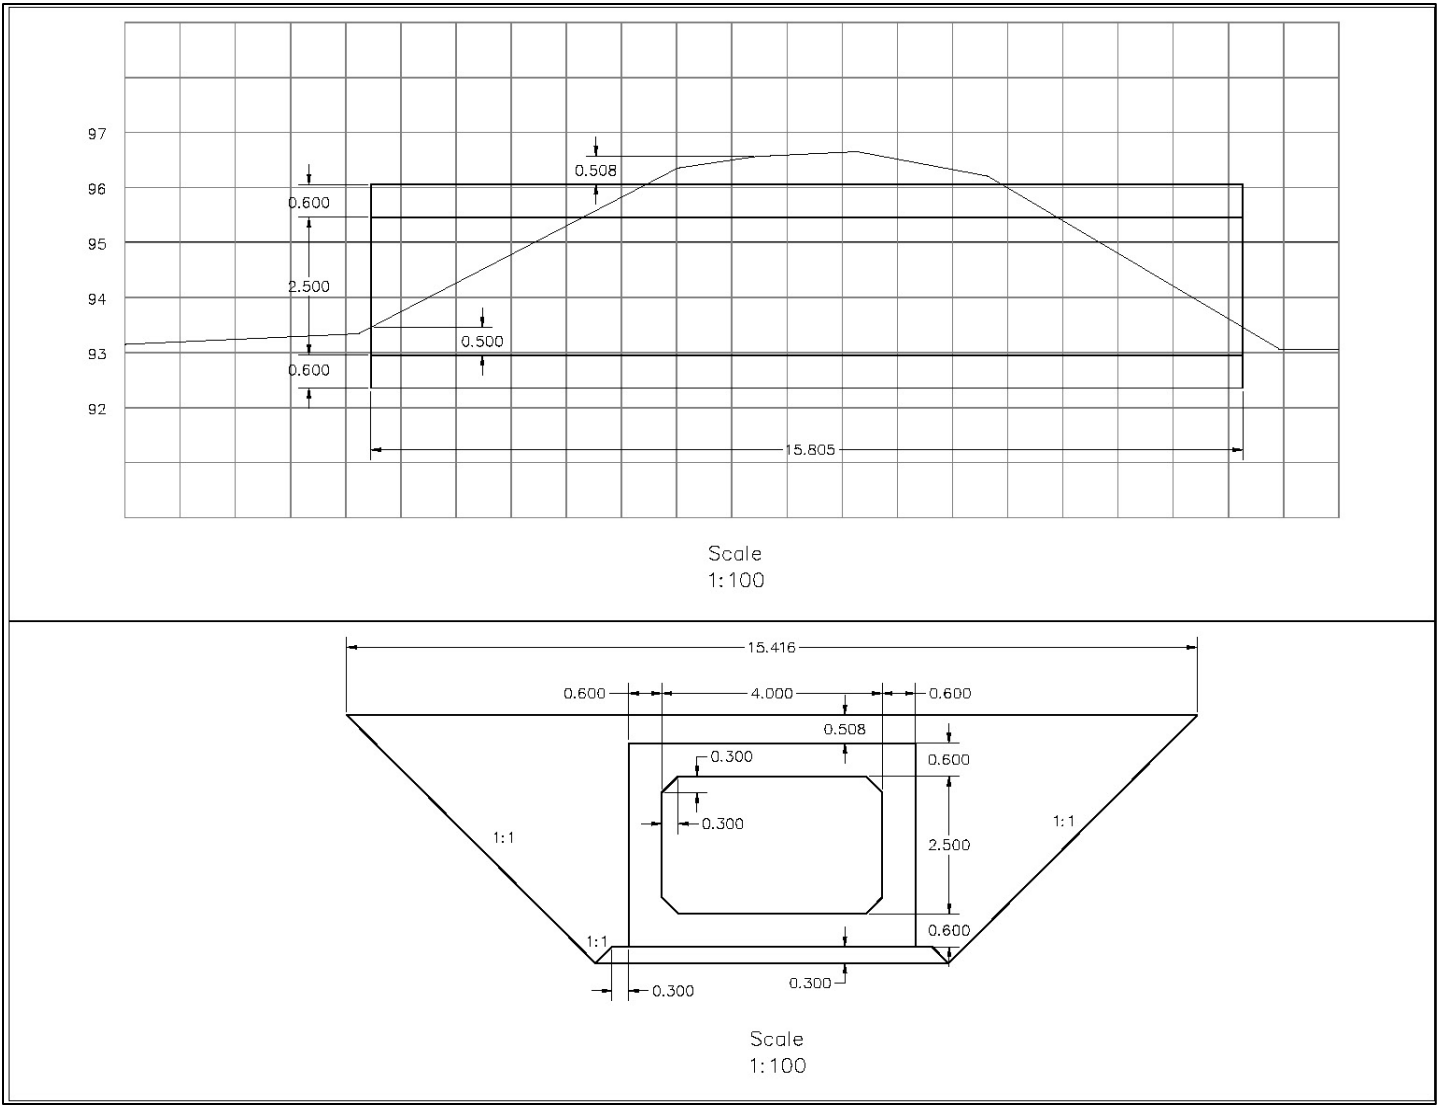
Proposed Metrolinx 1 – South Tunnel arrangement (Draft)
